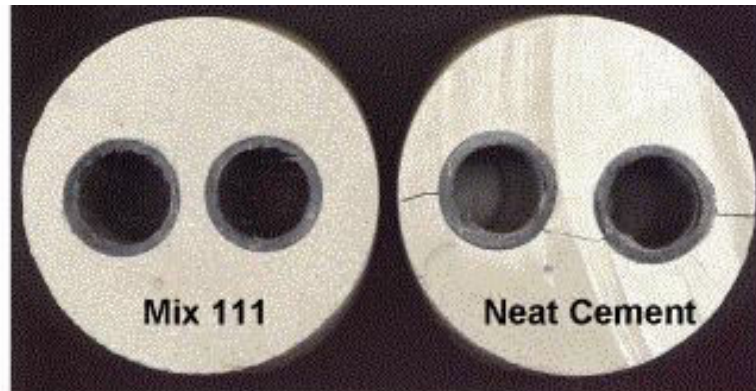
Section of geothermal borehole showing undesirable grouting conditions. [Source: (Allan and
